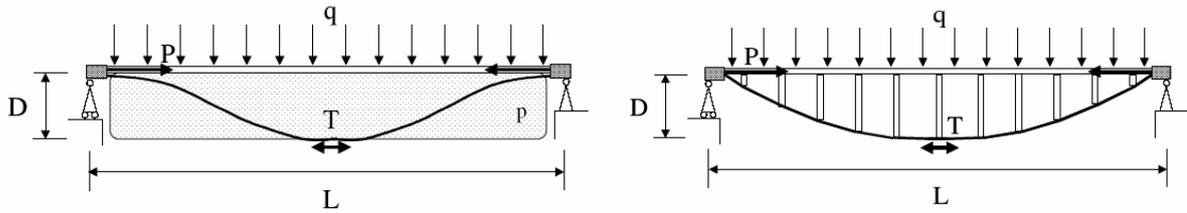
Tensairity girder (left) compared to a truss girder (right). Basically, the vertical struts of the truss are replaced by an airbeam in the Tensairity structure with important consequences.
